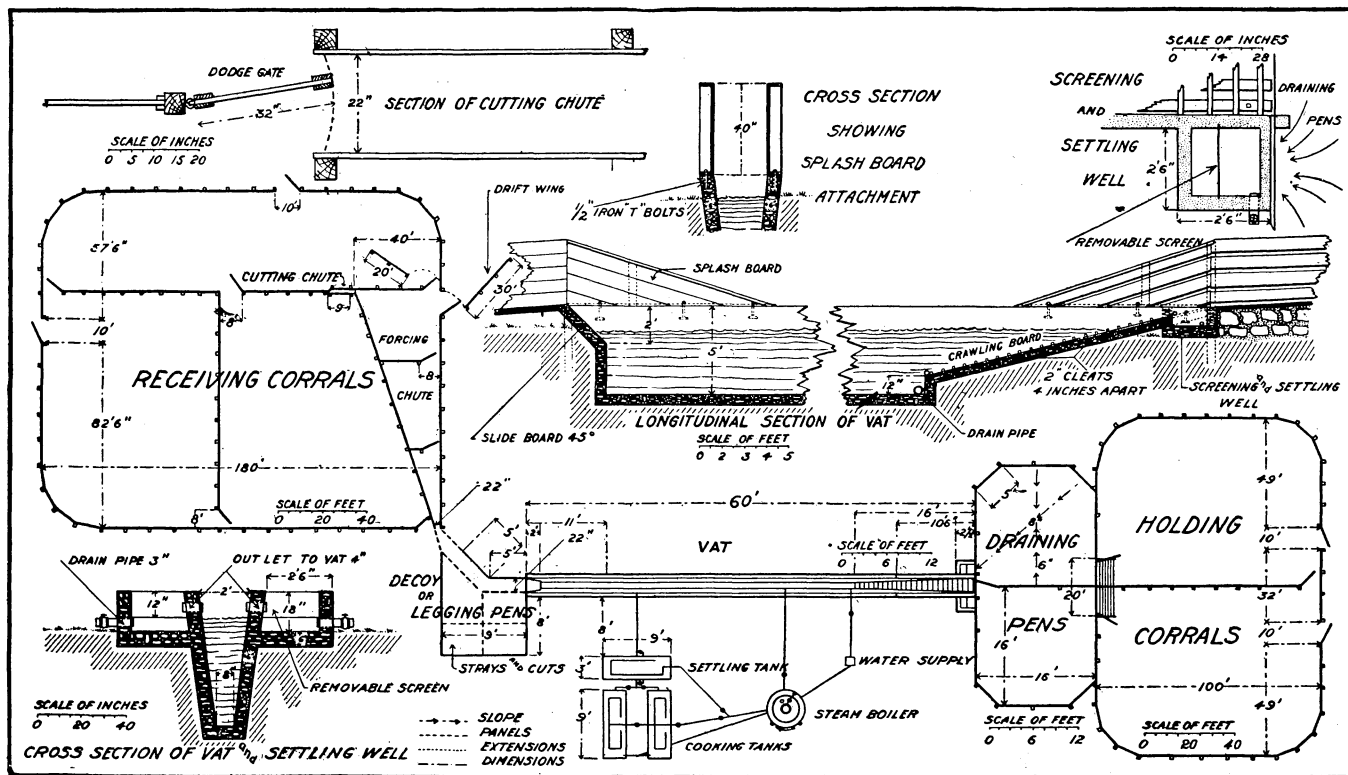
Plan of sheep-dipping plant; cement vat.
